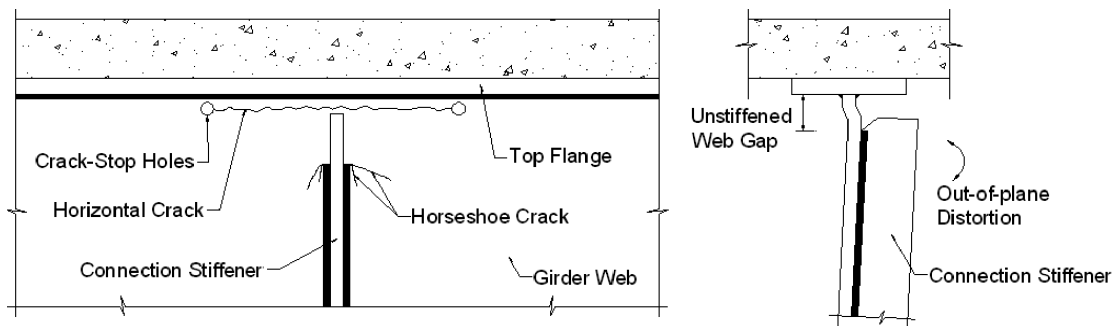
Fatigue crack caused with drilled crack-stop holes in steel bridge girder.
